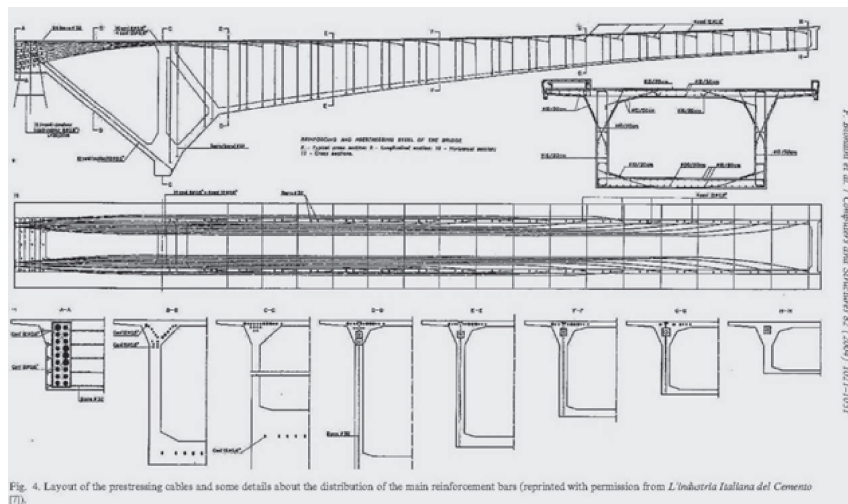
Layout of the prestressing cables and some details about the distribution of the main reinforcement bars (reprinted with permission from *L'industria Italiana del Cemento* [7]).
